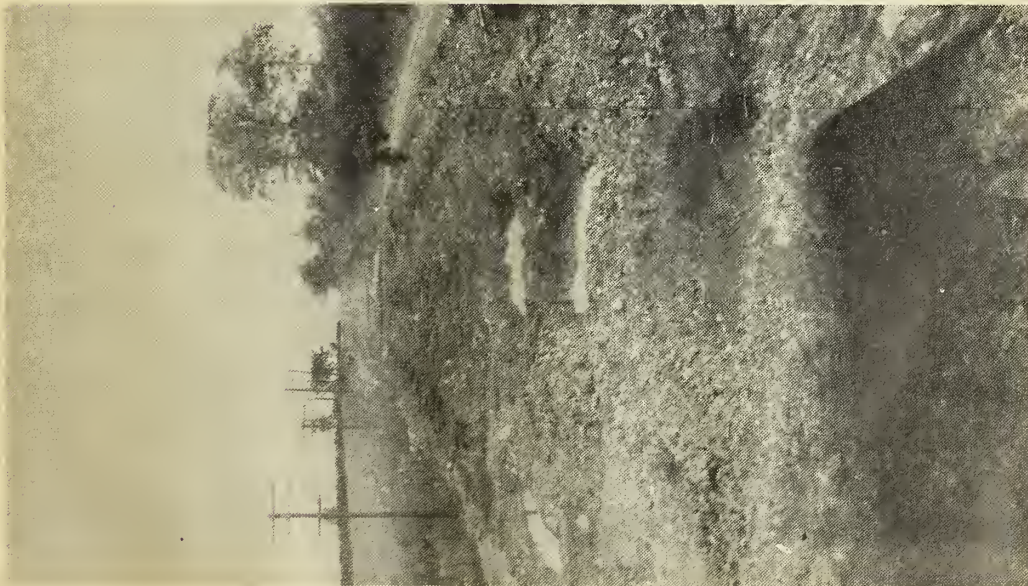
The ponding method using 3 rows of staggered trenches each 12 feet long and 4 feet wide
